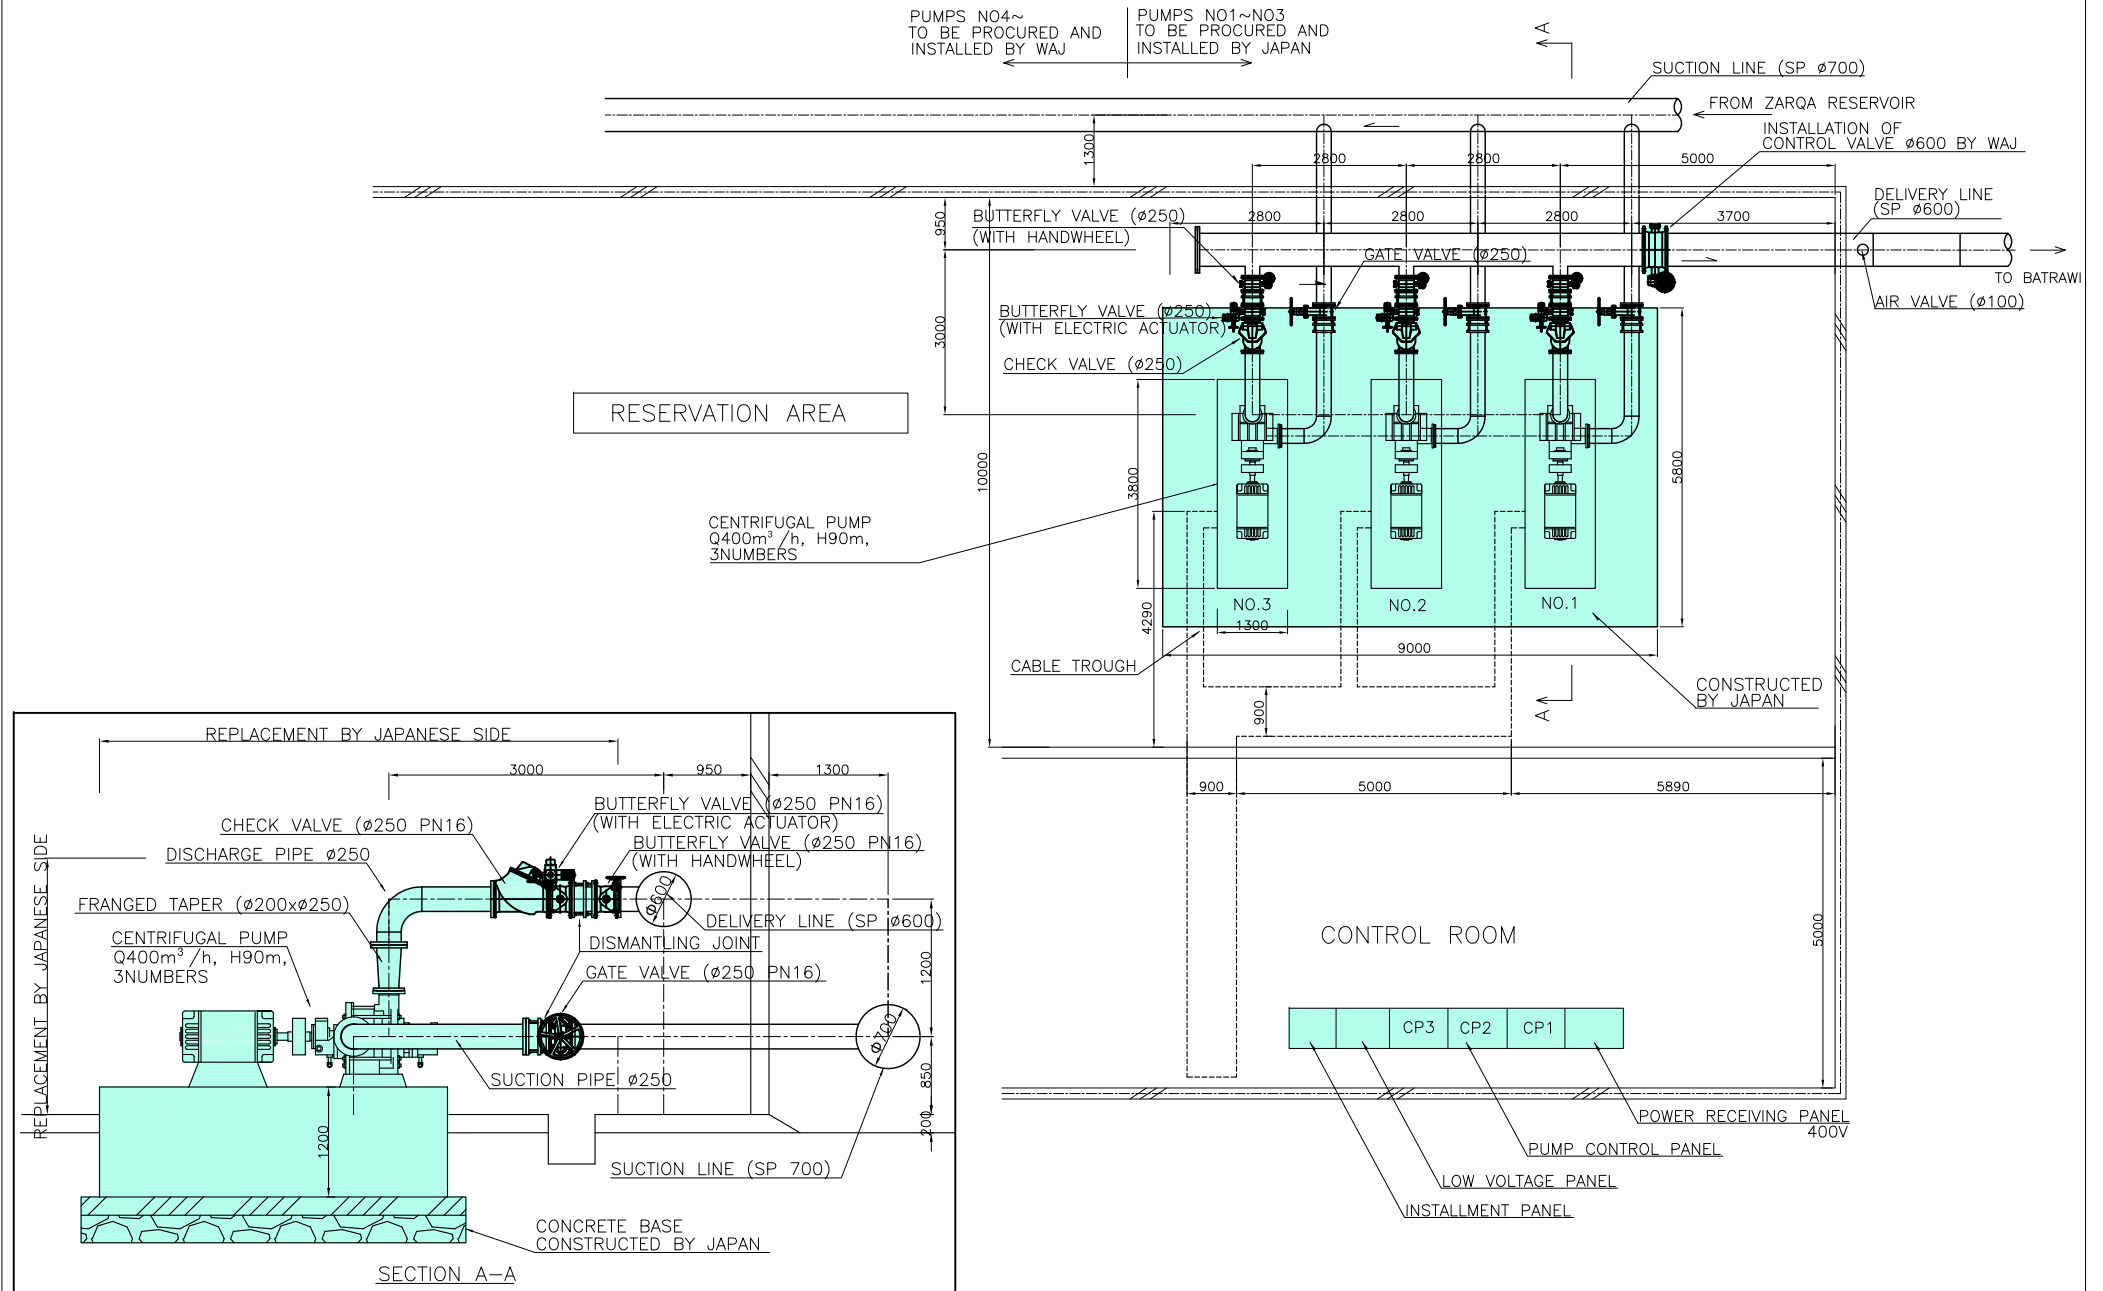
Installation Plan of Pumping Equipment of Zarqa Pumping Station
